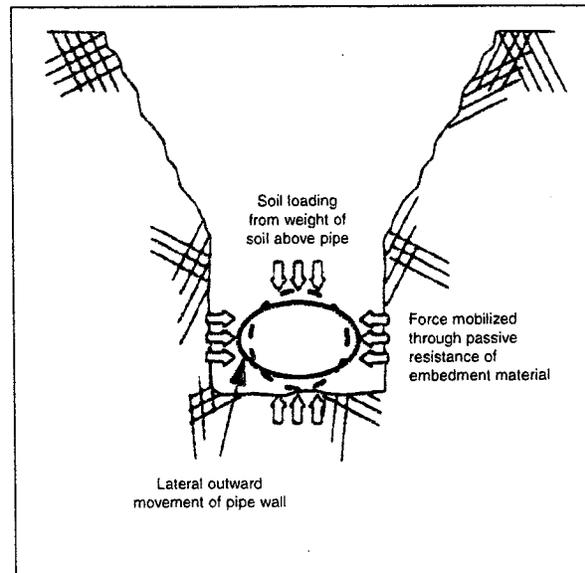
Mobilization of Enveloping Soil through Pipe Deformation
